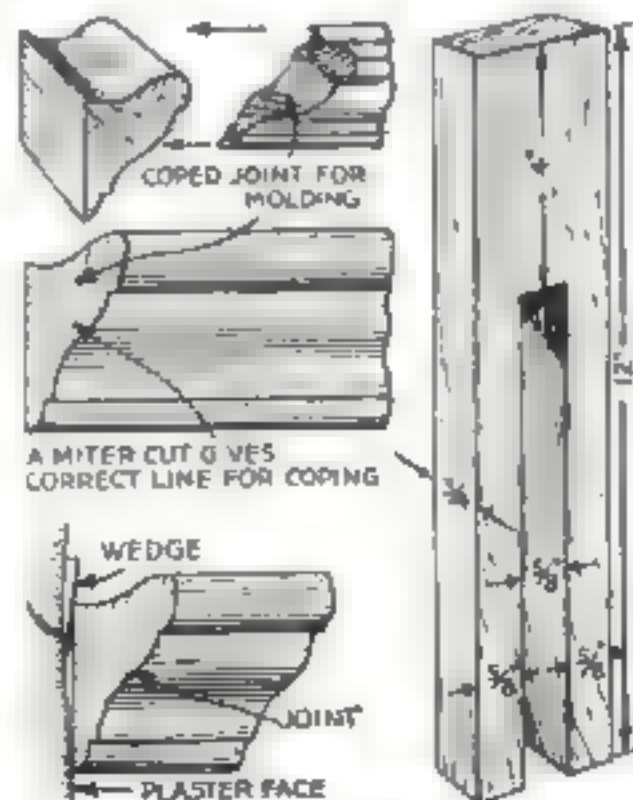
How picture molding is mitered and coped, and detail of a base hook.
